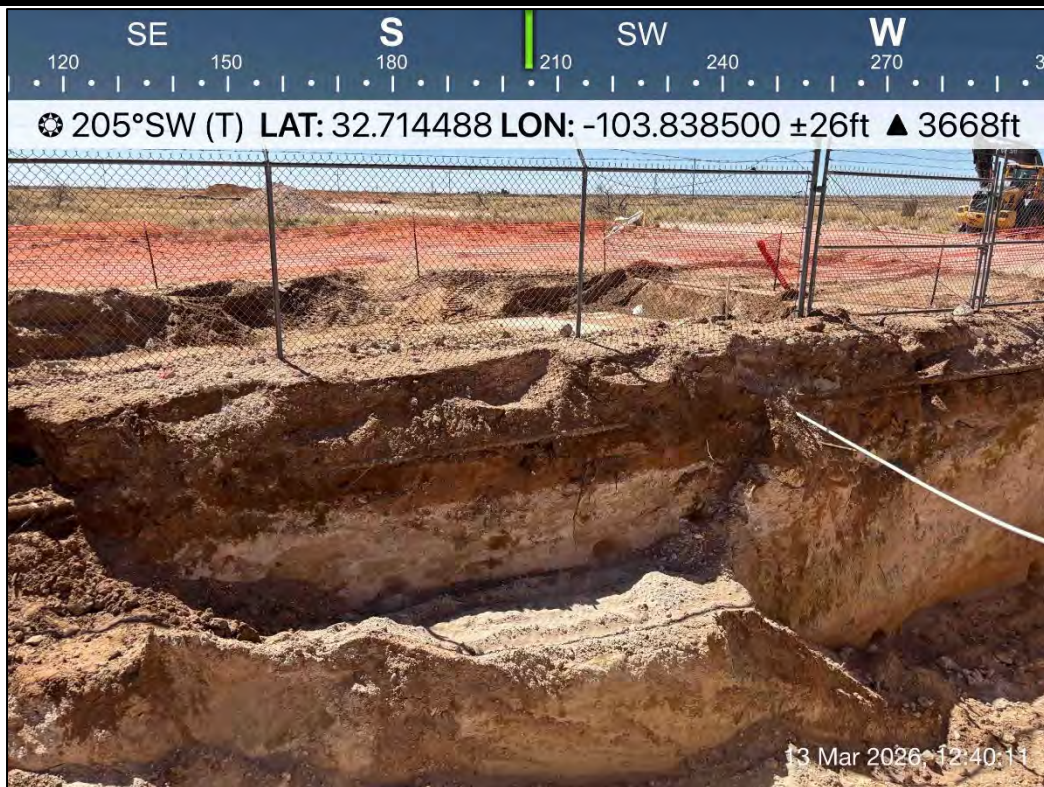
Southwestern view of excavation extent. 3/13/2026
